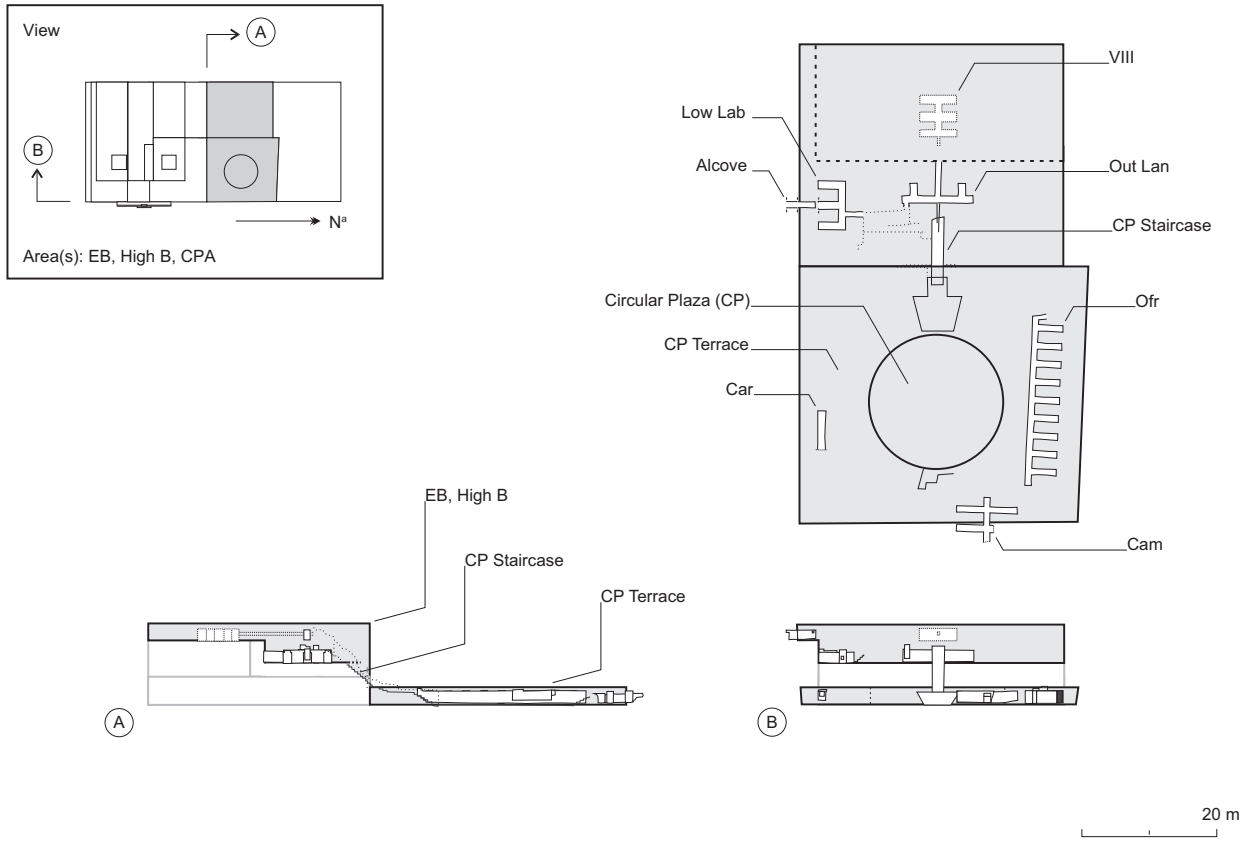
Building B Construction Phase 3, with Circular Plaza Atrium: EB–High B–CPA Phase; plan and architectural north (A) and west (B) profile views.
